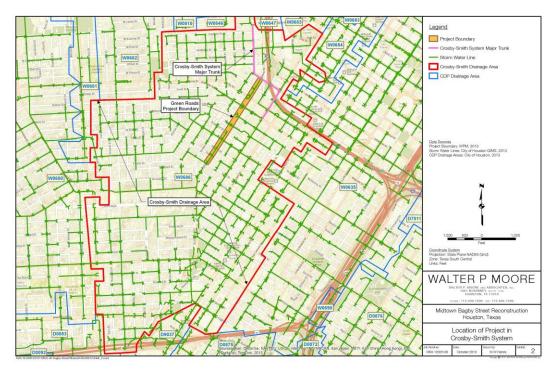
Bagby Street Drainage Map from "Midtown Bagby Street Reconstruction Stormwater Management Report," Walter P. Moore
